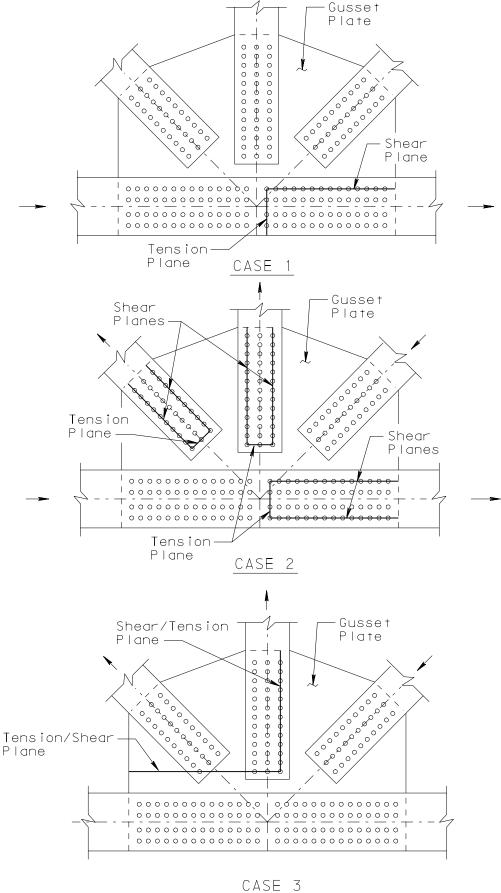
BLOCK SHEAR RUPTURE PLANES IN GUSSET PLATE IN TENSION
